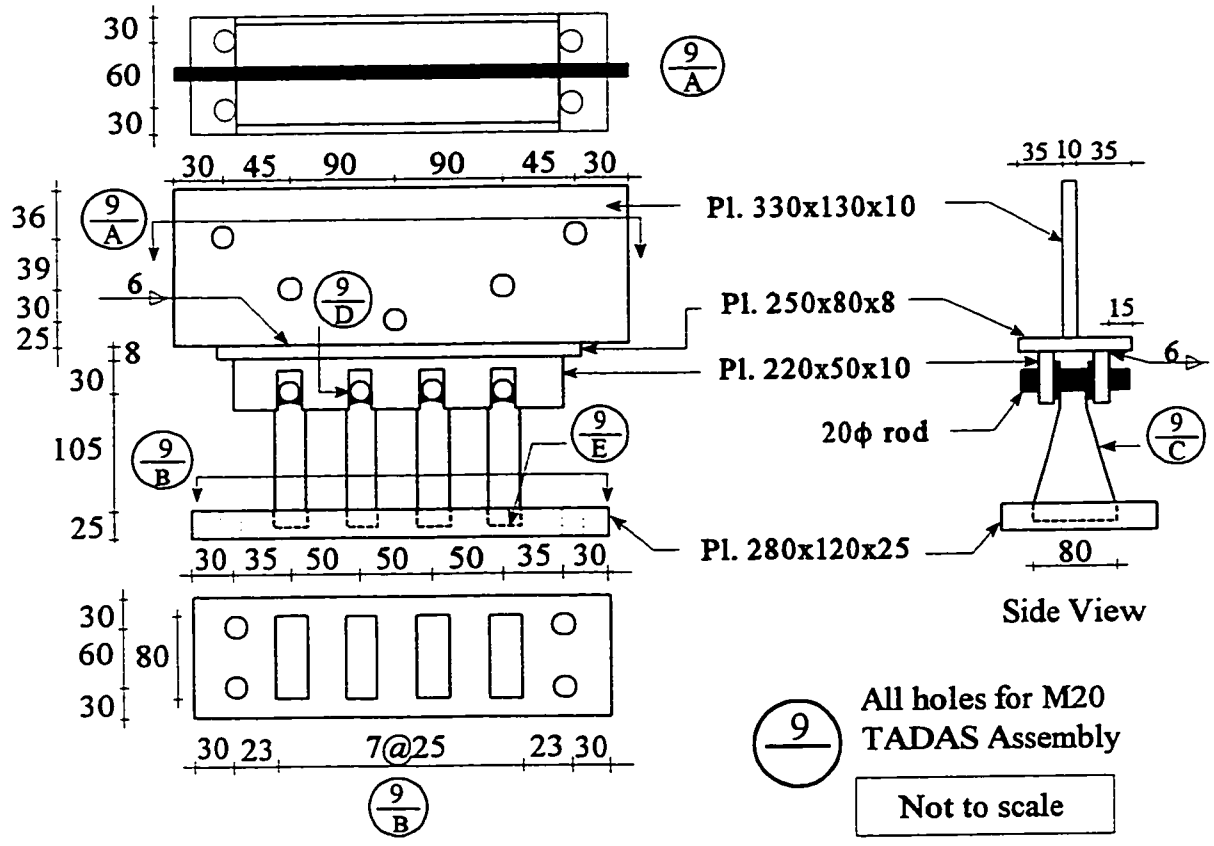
TADAS assembly designed for the TADAS specimen.
